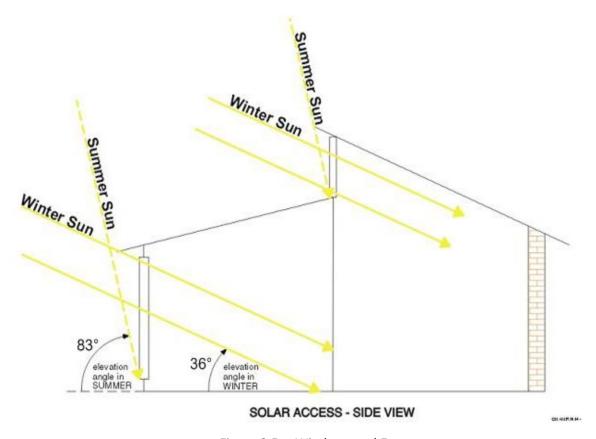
Windows and Eaves (source http://www.bom.gov.au/climate/environ/housedesign/solar_access.shtml)
